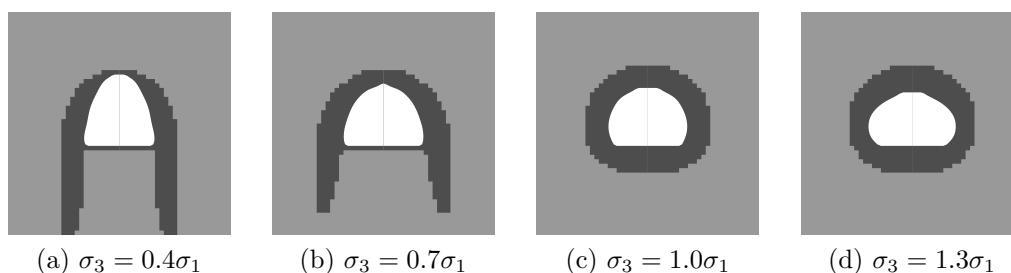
Optimum shape and reinforcement of tunnels with traffic load.
